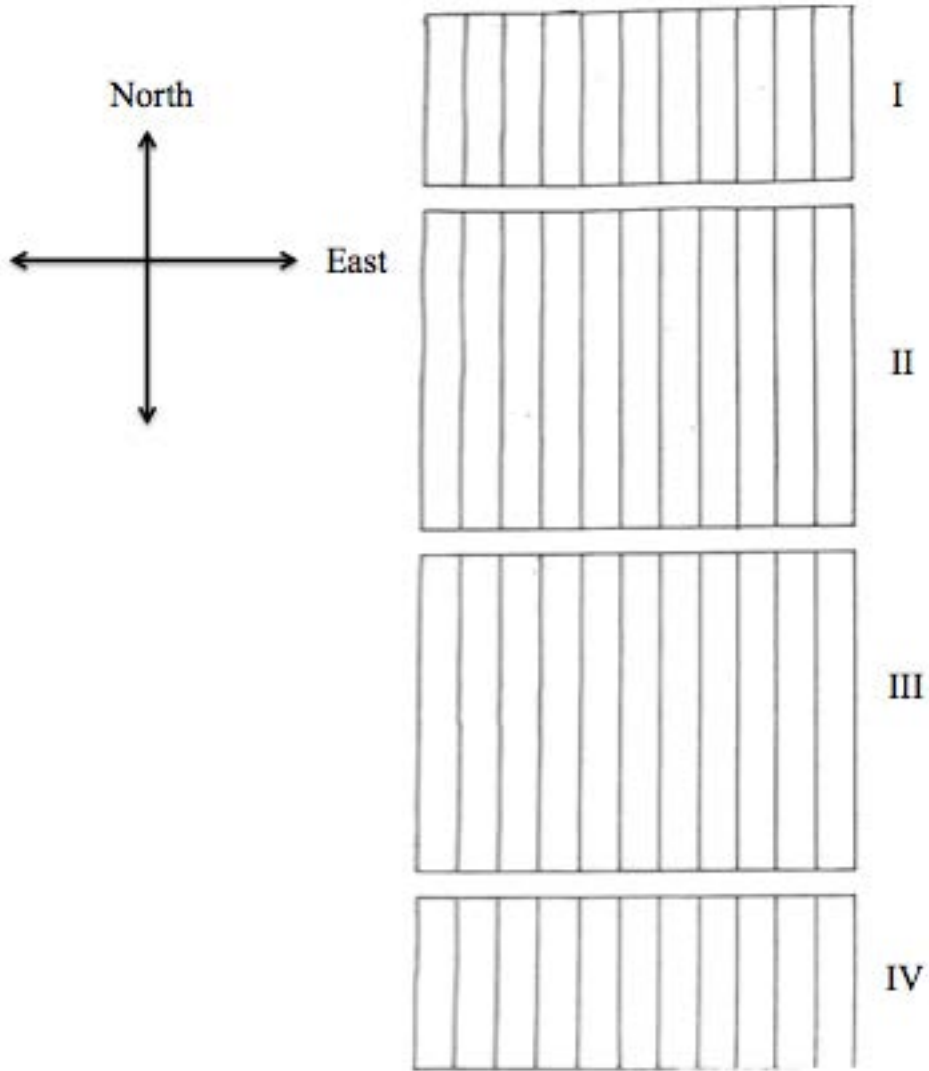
Layout of the four divided sections of the Foster Road overpass, San Angelo, Tom Green Co., Texas showing the 11 joint openings running north and south. Bats roosted in the crevices of each joint opening (represented by the 11 black spaces per section in the figure).
